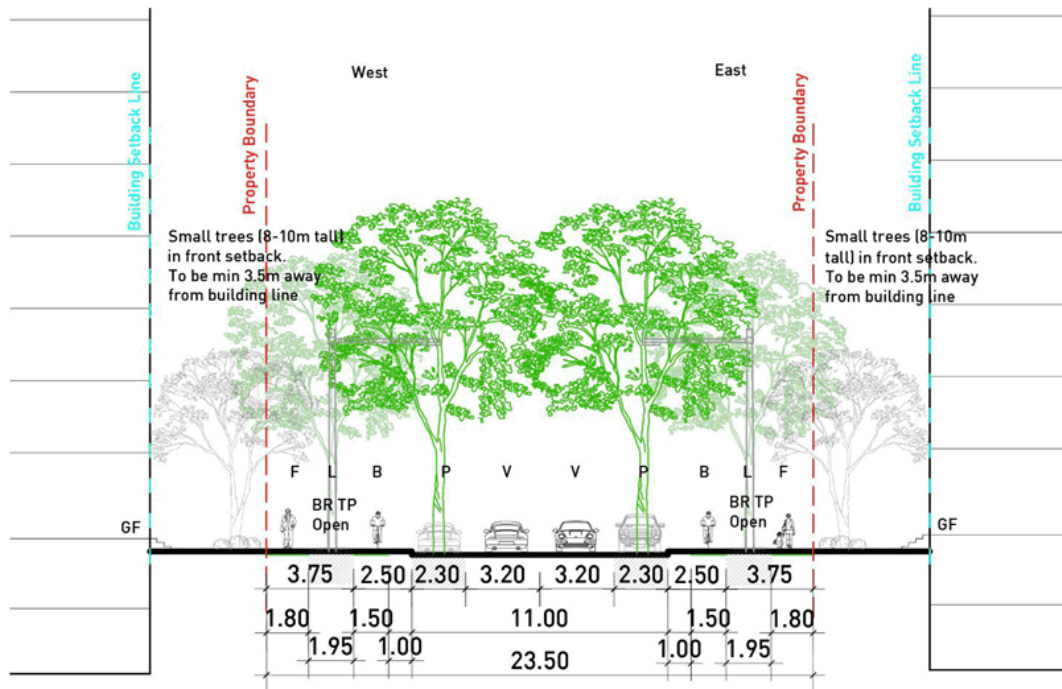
Type 2A Main Road with Cycle Tracks (NSR 3)
